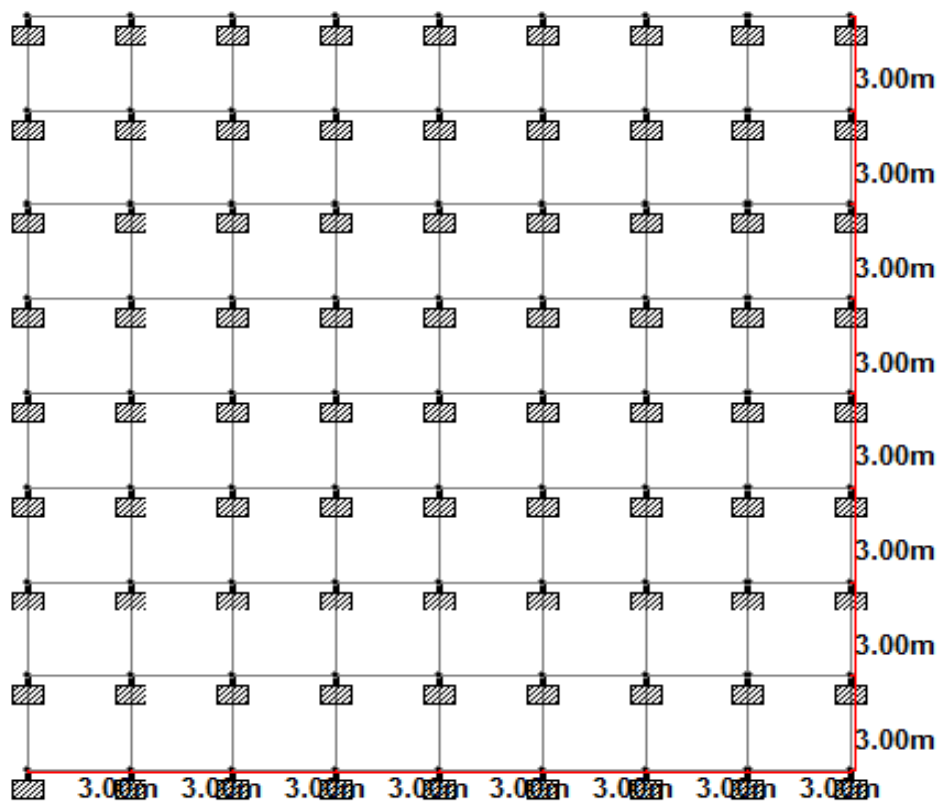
Typical Floor Plan For All Buildings In STAAD Pro
